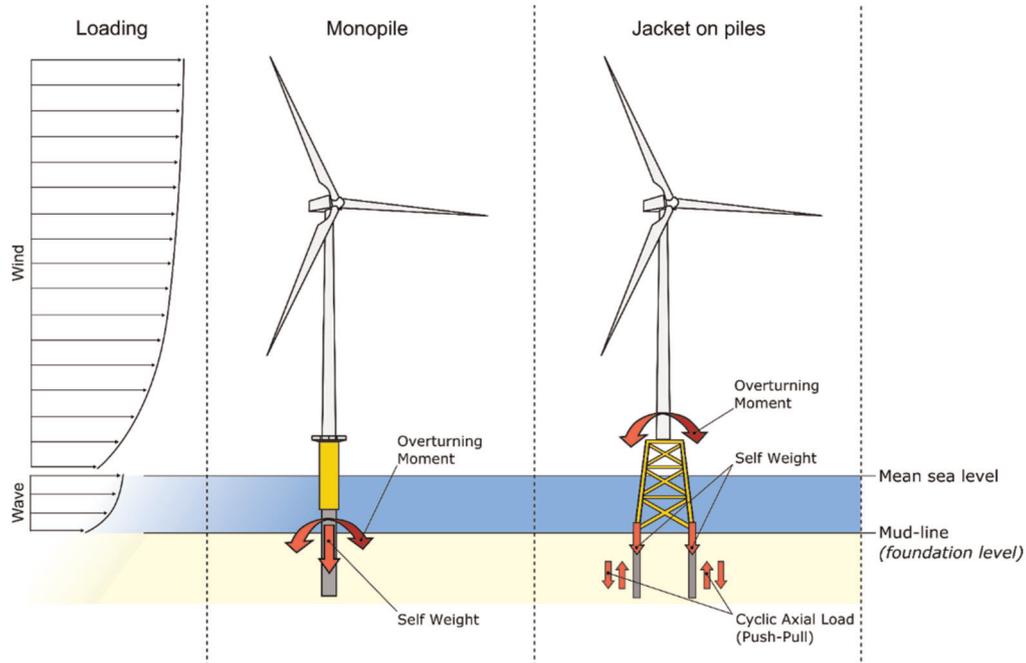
Load transfer mechanisms for monopile and jacket supported on piles
